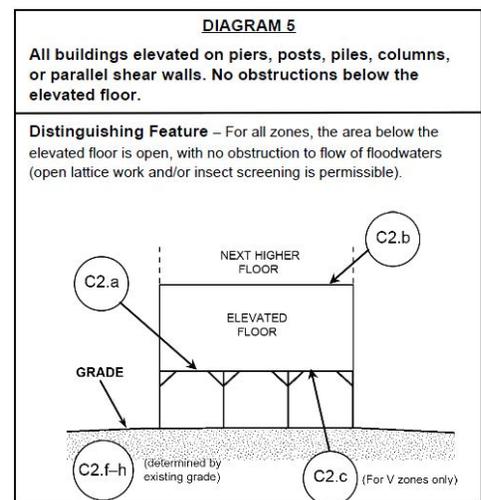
Building diagram for structure elevated on piers, posts, piles, columns, or parallel shear walls.
